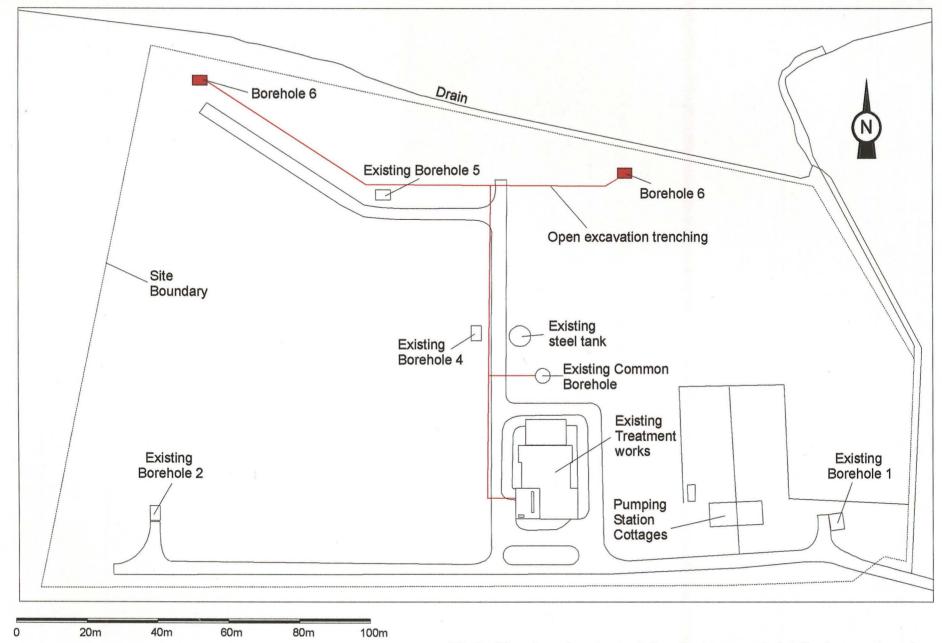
Site plan showing existing features and detail of current works (taken from a plan supplied by the client)
